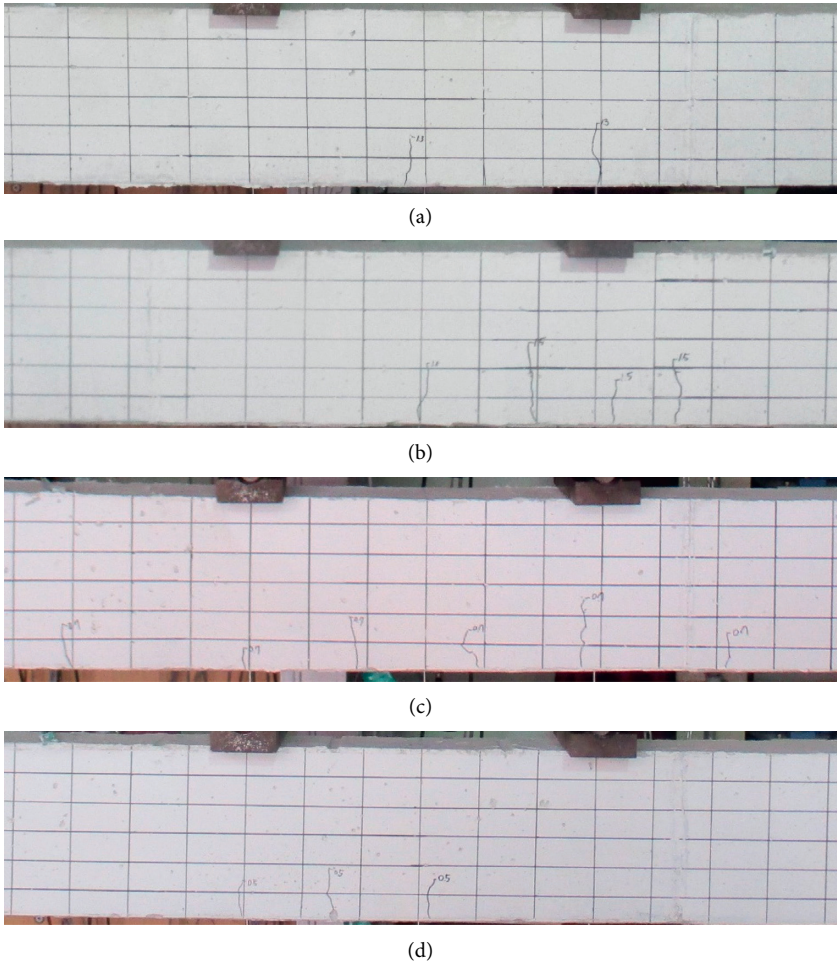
Typical crack patterns at the initial cracking stage ($P = P_{cr}$) (S2 series beams). (a) Beam R000-S2. (b) Beam R030-S2. (c) Beam R050-S2. (d) Beam R100-S2.
